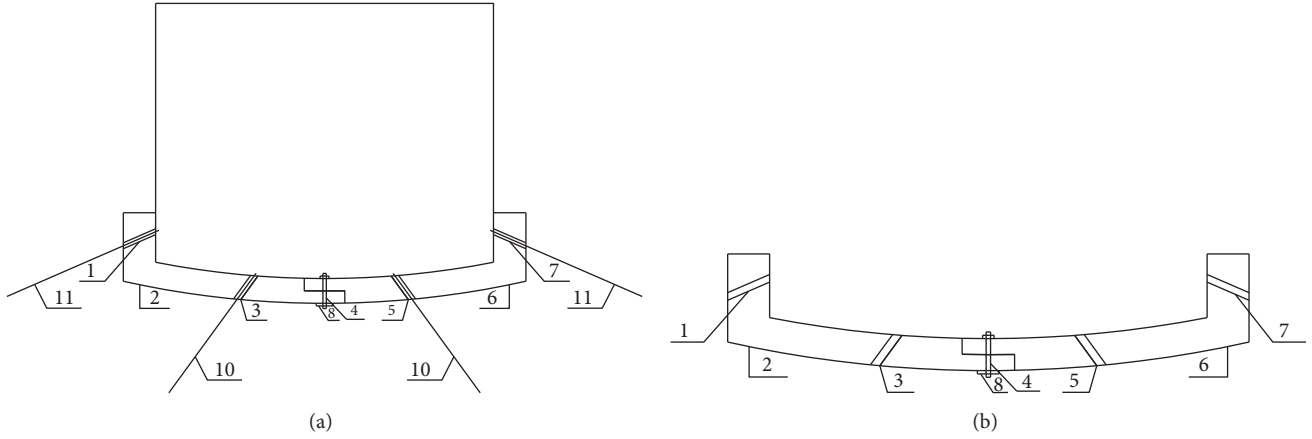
The schematic diagram of component installation. 1, 3, 5, and 7 bolt hole; 2, 6 split arch structure of precast concrete; 4 bolt; 8 cushion block; 9 bolt connection hole; 10 floor bolt; 11 bottom corner bolt.
